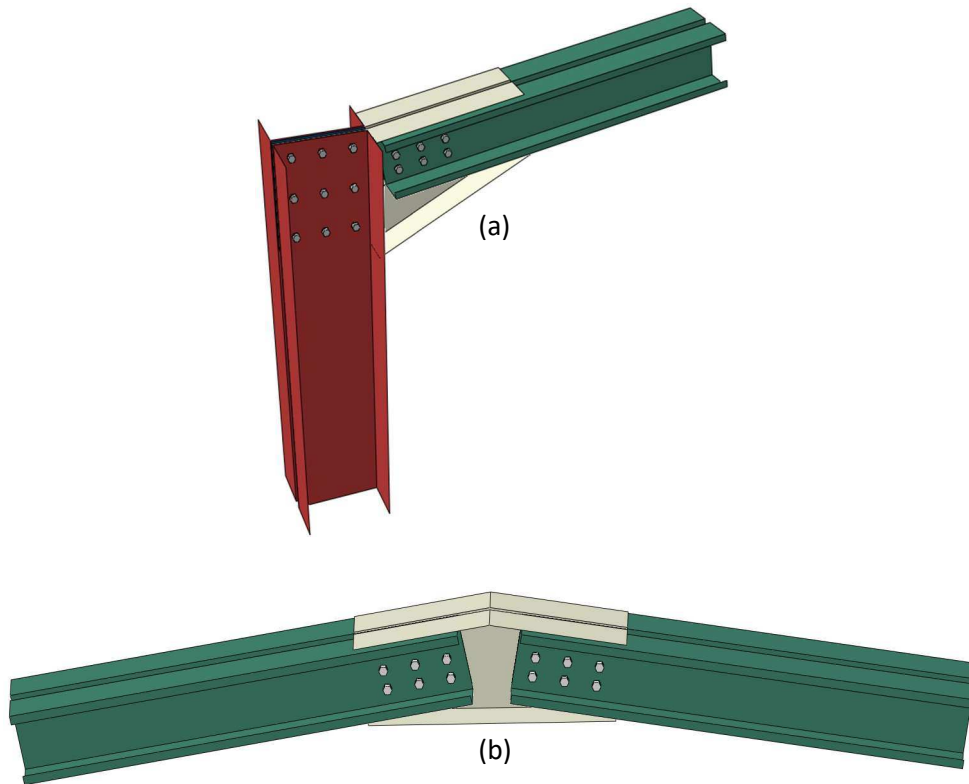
Typical CFS moment resisting bolted connections: (a) eaves connection, and (b) apex connection
